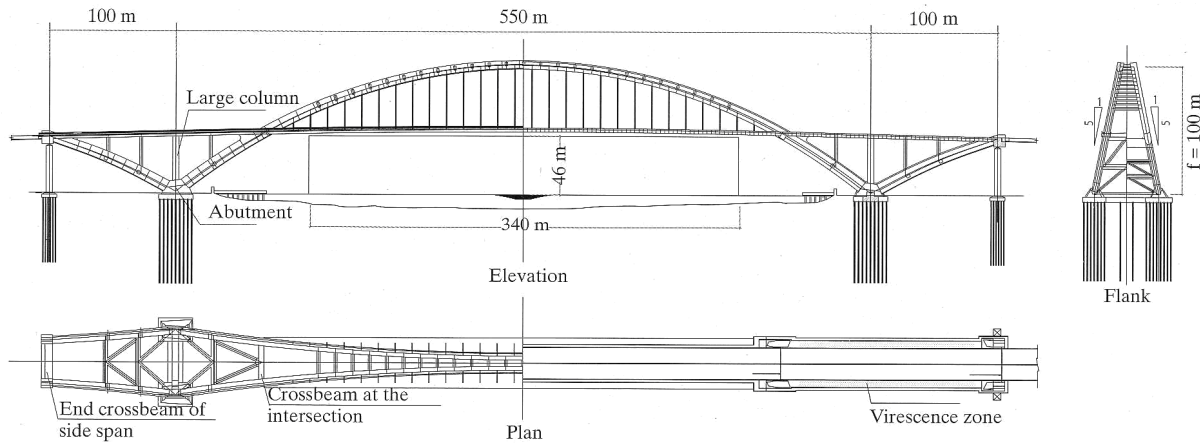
General arrangement of Shanghai Lupu Bridge (Unit: m)
